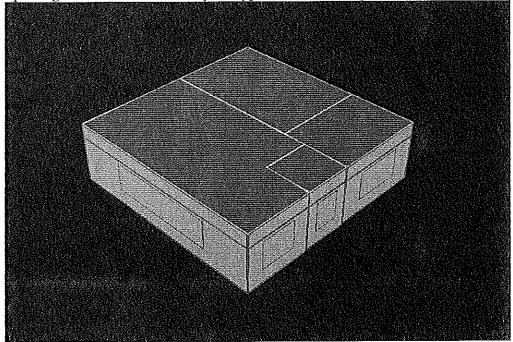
FAST FOOD RESTAURANT BUILDING RENDERING
